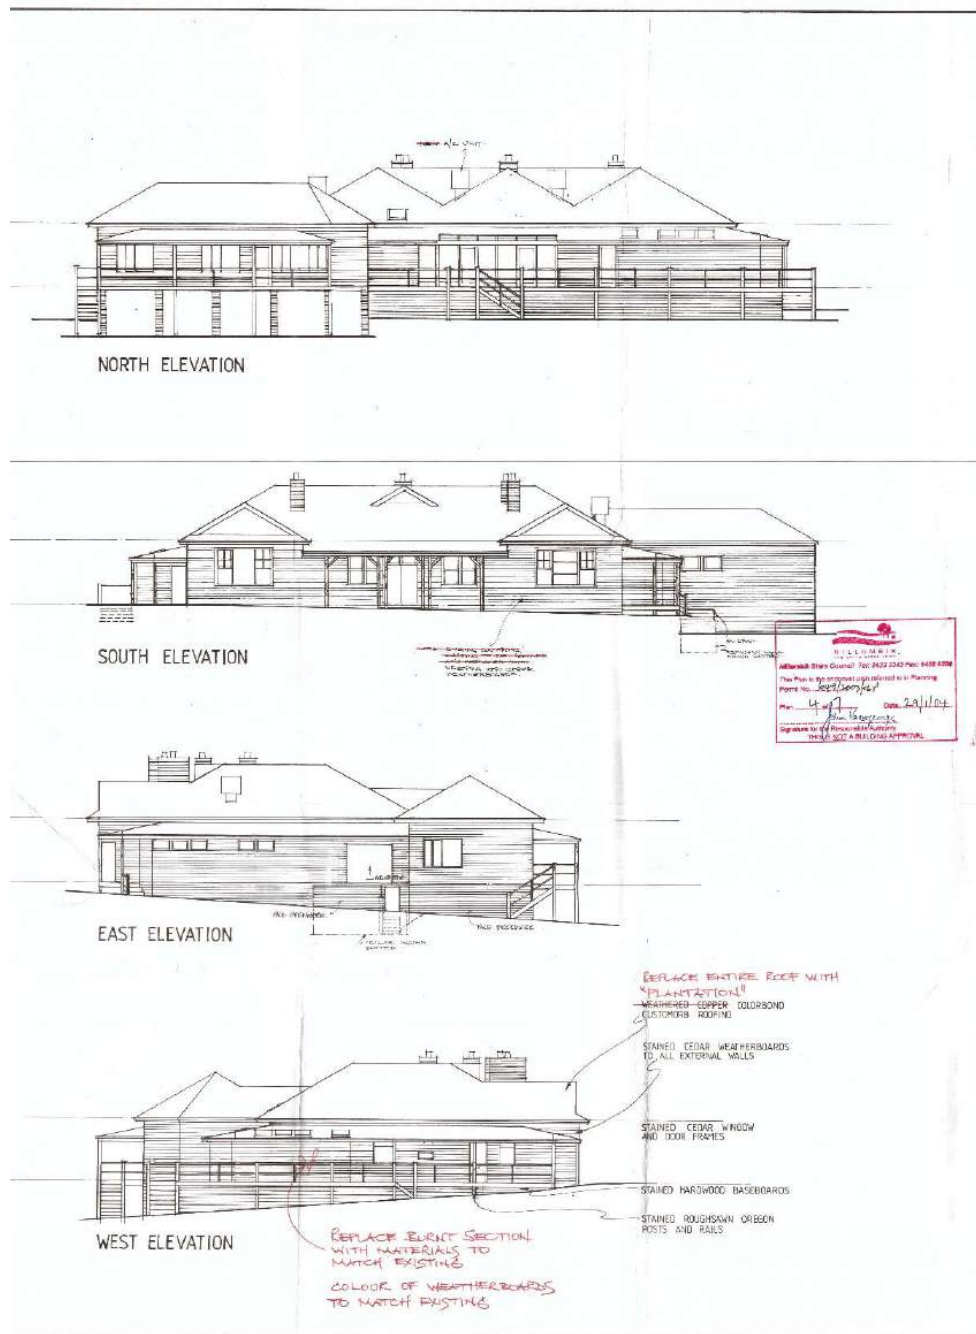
Plans for refurbishment work to the Pantan Hill Hotel after fire damage, 2003. (Source: BP).
